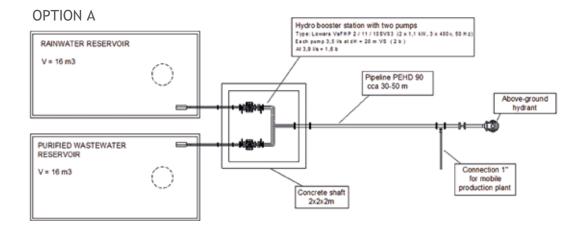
Preliminary construction plan of reservoirs and equipment - Alternative 1
